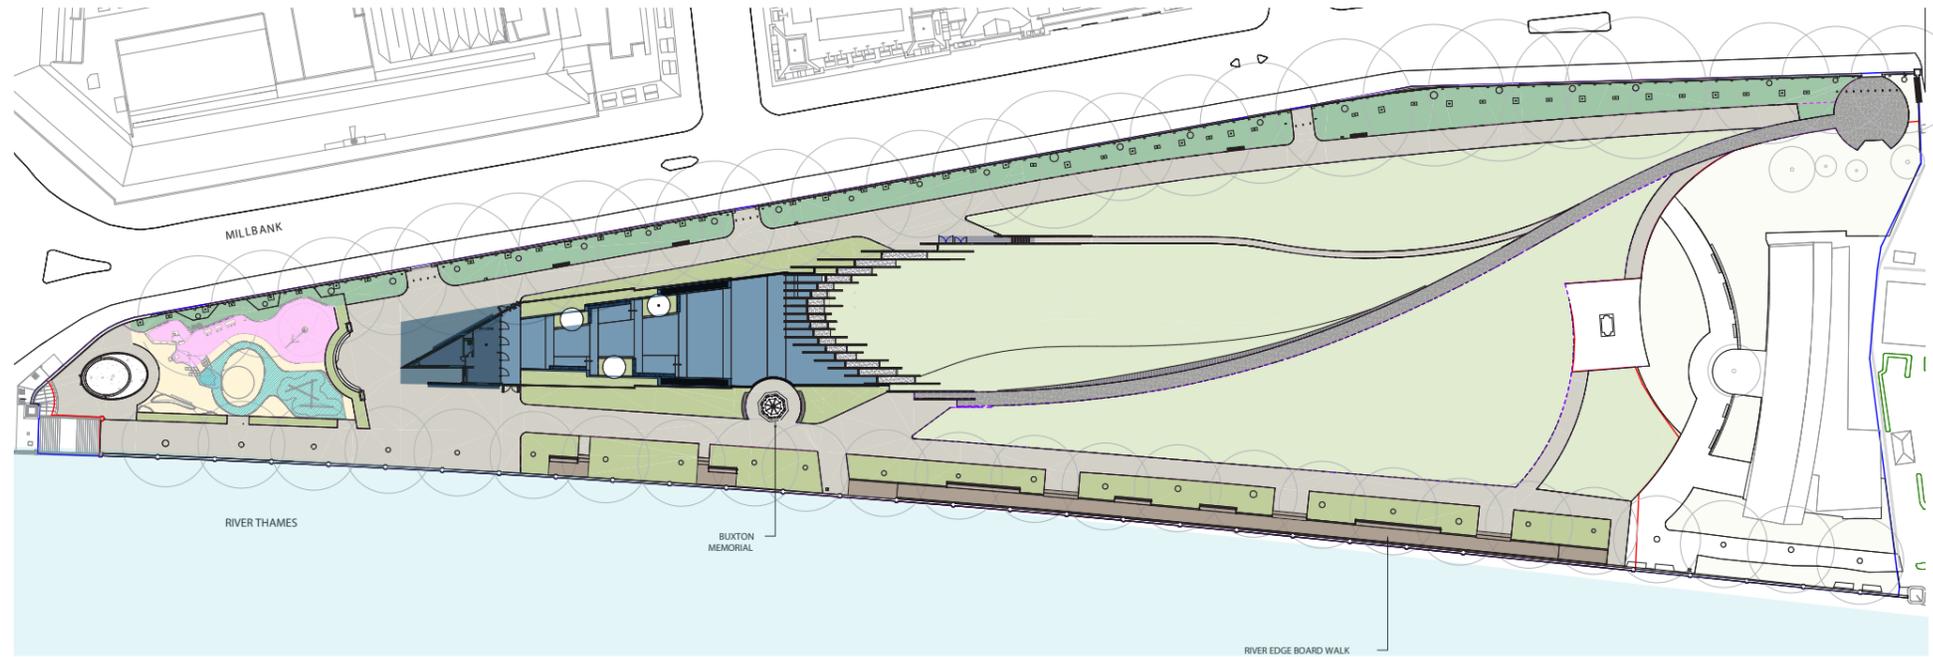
PROPOSED MATERIAL PLAN ACROSS VICTORIA TOWER GARDEN
